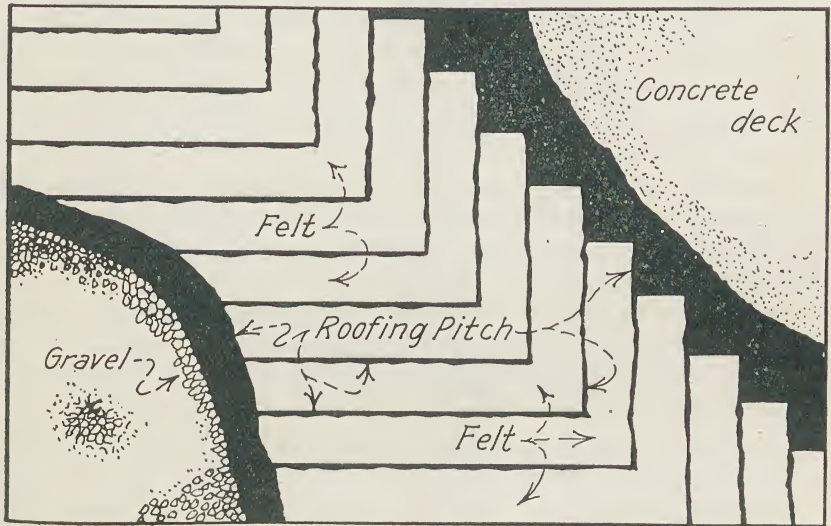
Four-ply Built-up Roofing on Concrete Deck
